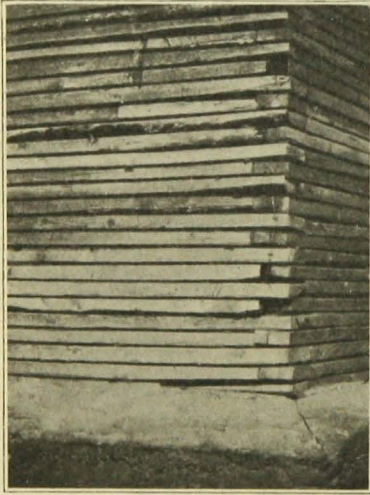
Corner of Crib Silo Showing Rough Lumber Used
